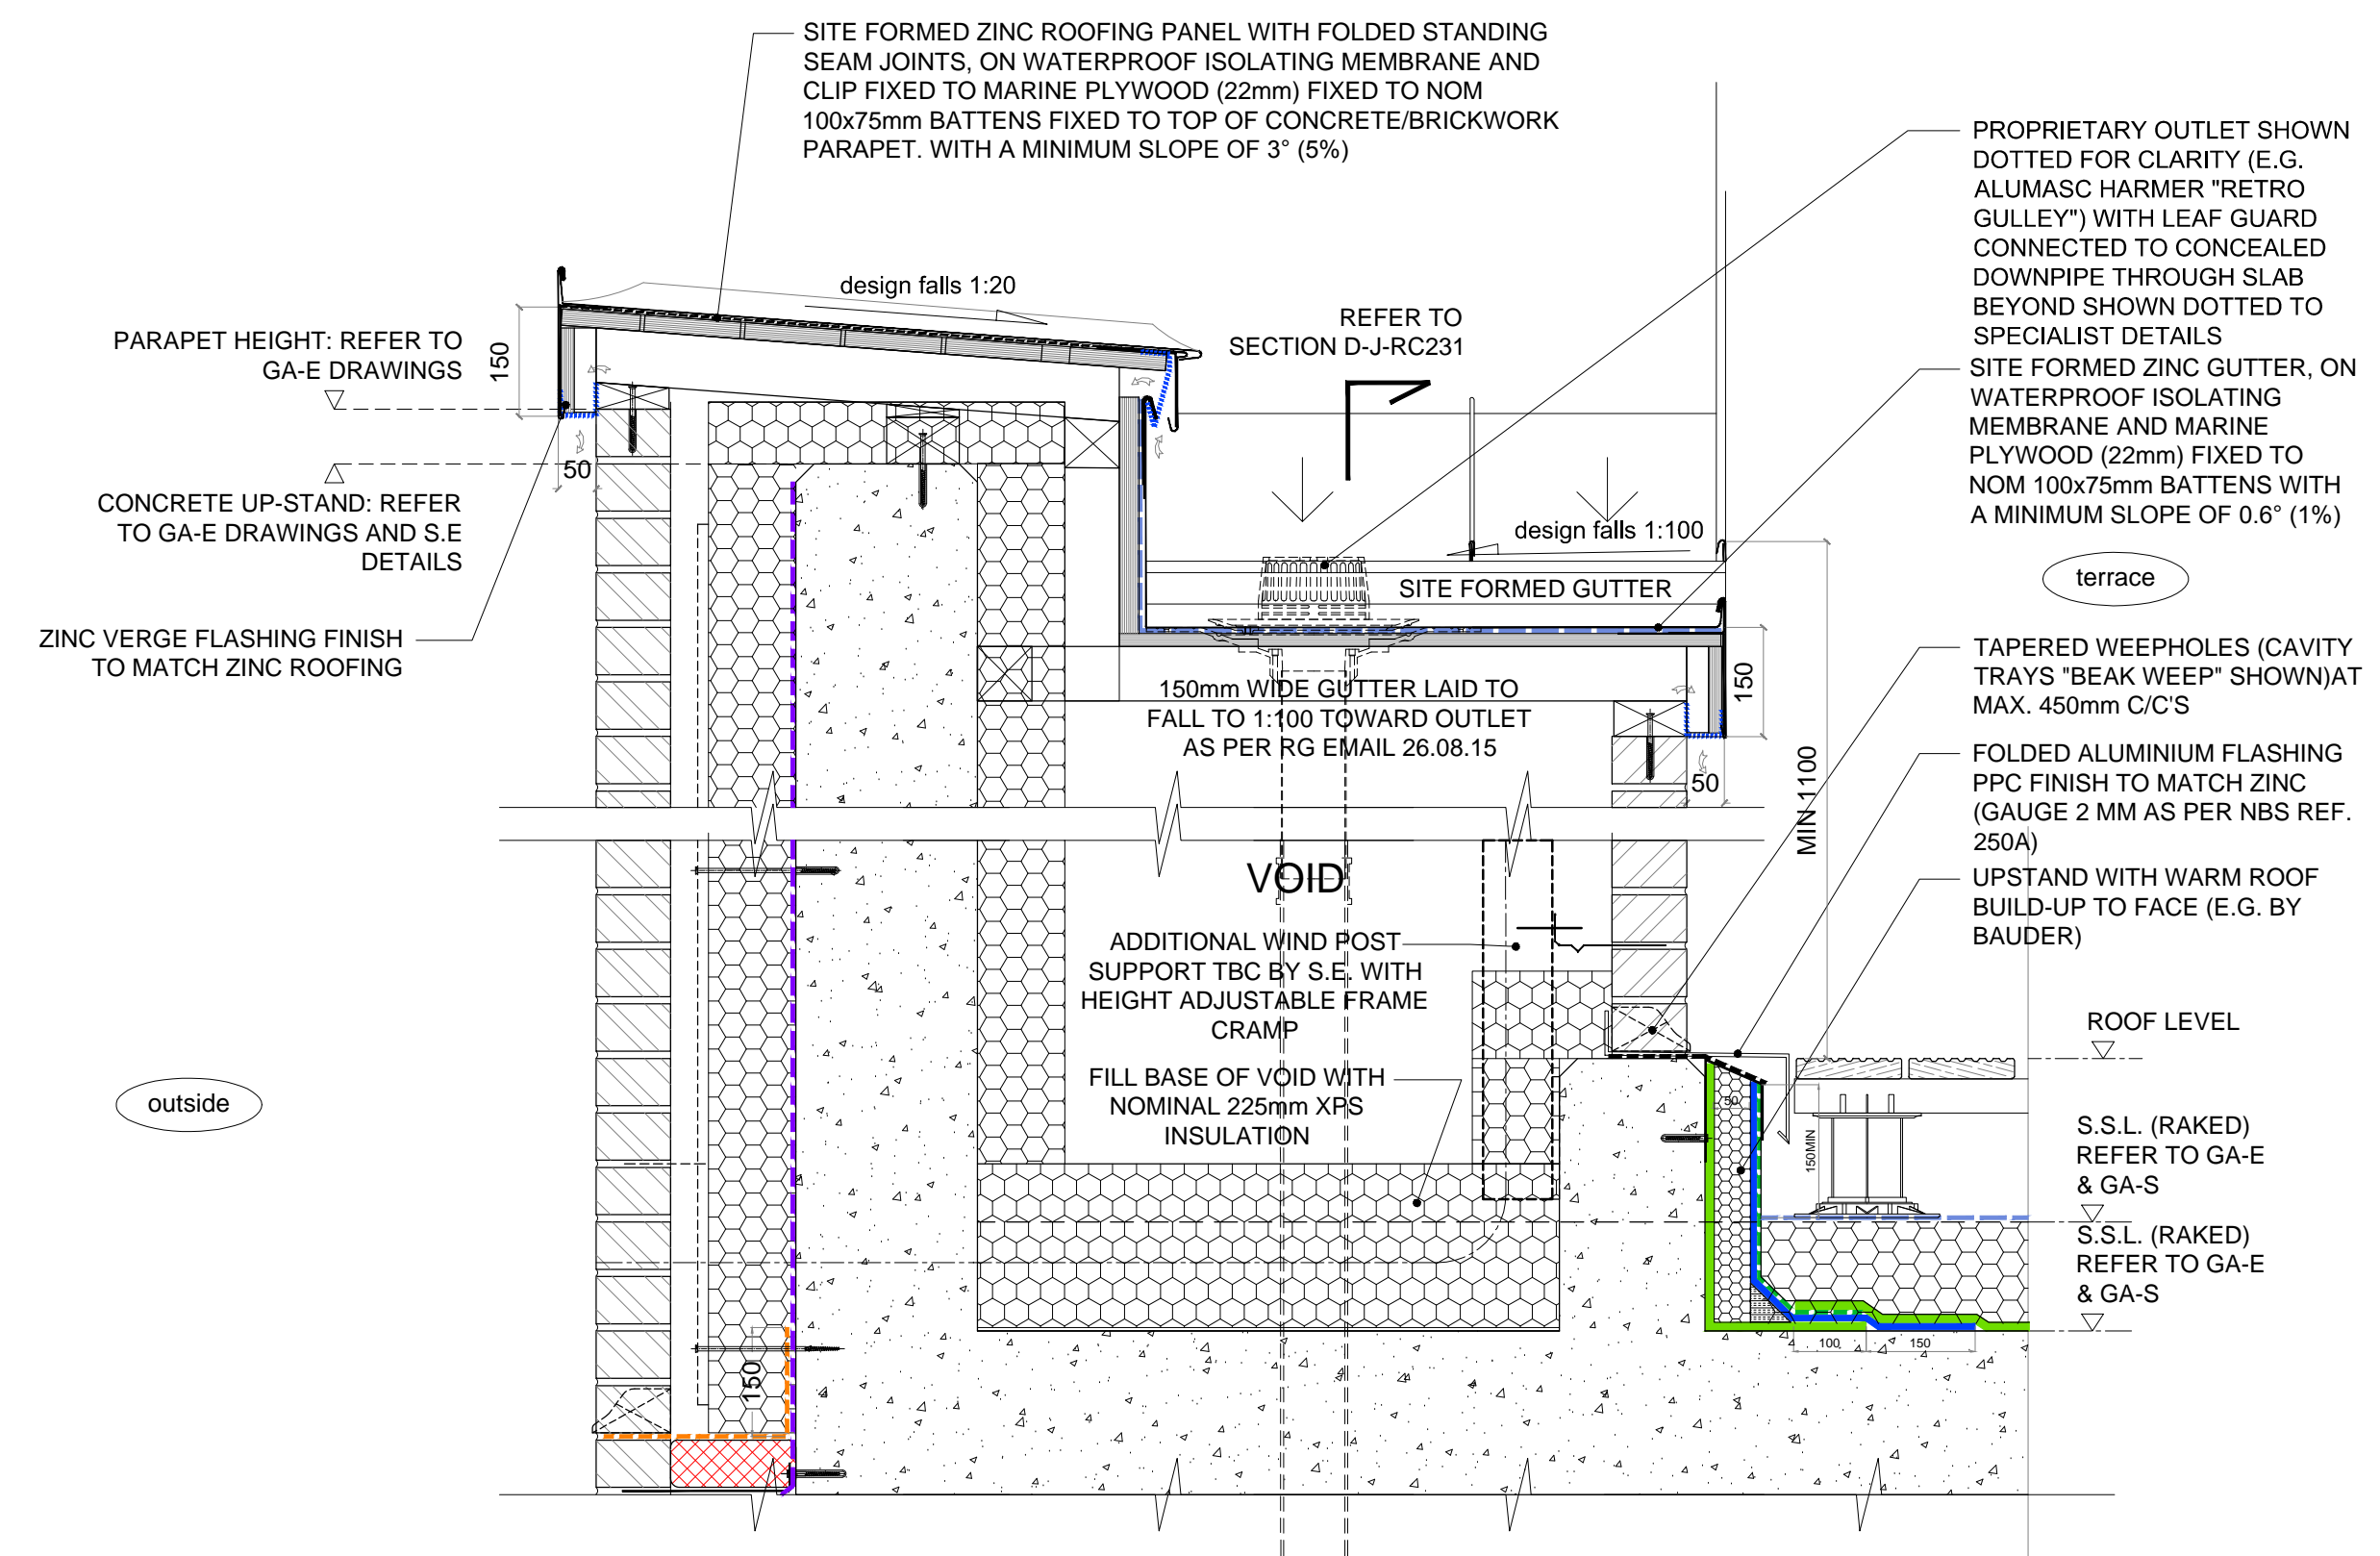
DETAIL - Block C - D-J-RC226 - Parapet/Transition of fall (L05 GL G1/H-05)
